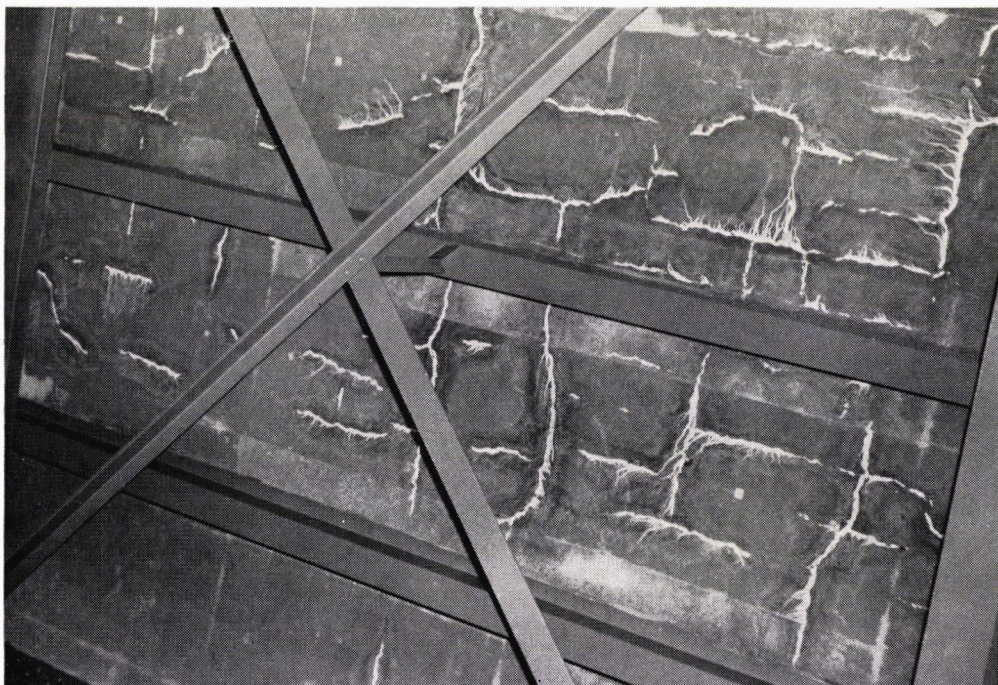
Penetrating cracks as seen from beneath bridge. Patterns follow positions of reinforcing rods.
